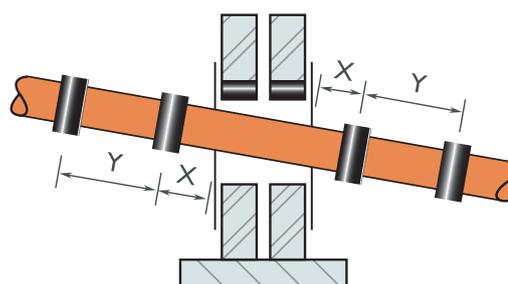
Diagrammatic sections showing pipes passing through walls
